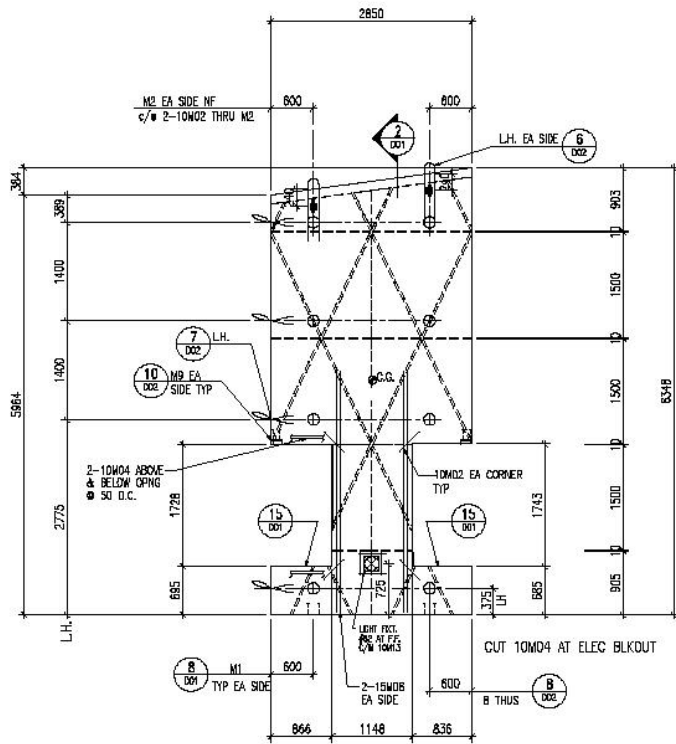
Blackfoot Crossing – typical piece fabrication shop drawing.
